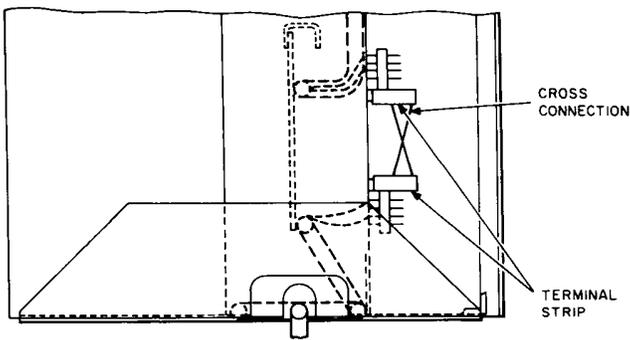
Arrangement for Terminating Local Distribution Cables When No Cross-Connecting Terminal is Provided—Side View
